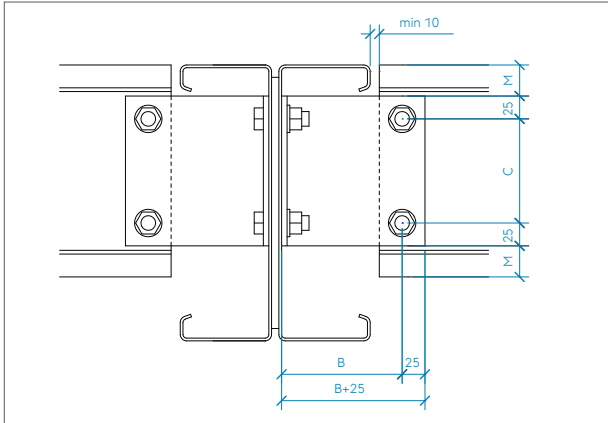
Detail of double-sided floor beam connection to a C+ girder
